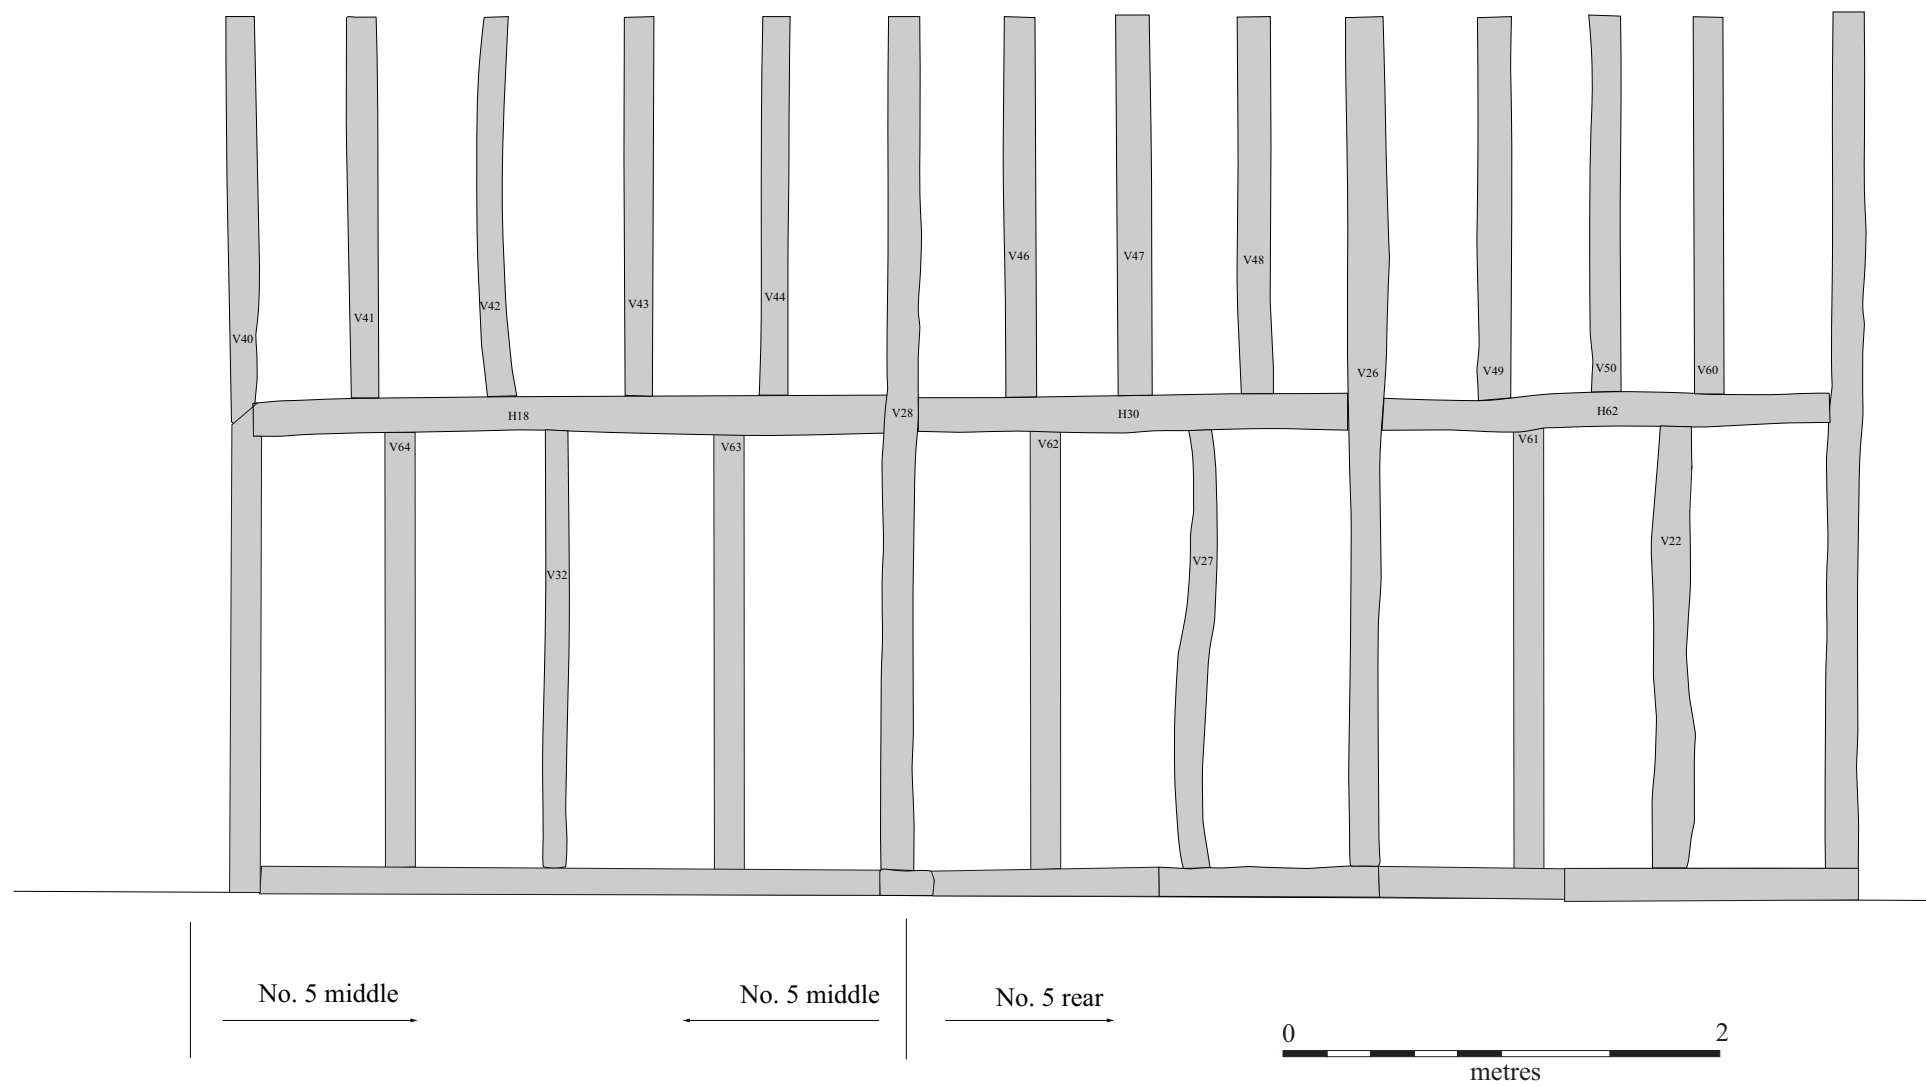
No. 5 Peas Hill, North facing elevation of north wall reconstruction (not to scale)
